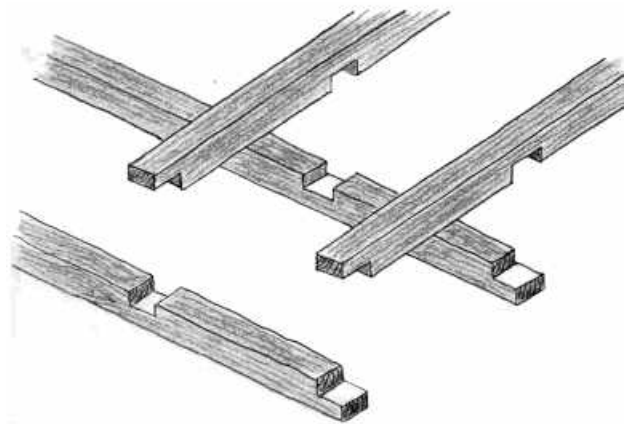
Typical connections between longitudinal and transverse timber elements (Vintzileou, 2008)
